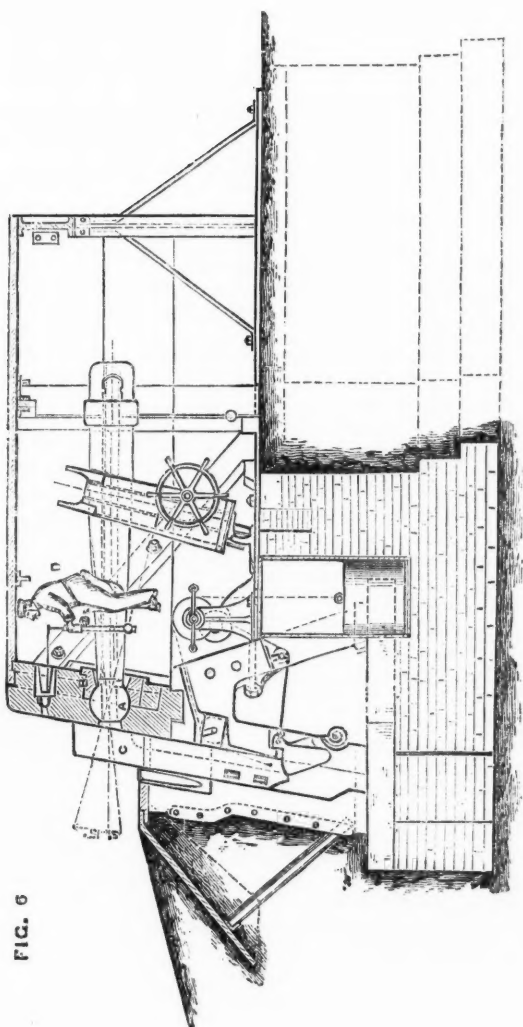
Section of muzzle-pivoting gun in armoured salient fort. A, removable ball-piece, screwed on to muzzle of gun; B, socket disc screwed into shield; C, shutter; D, number laying gun from saddle-seat on chase.
